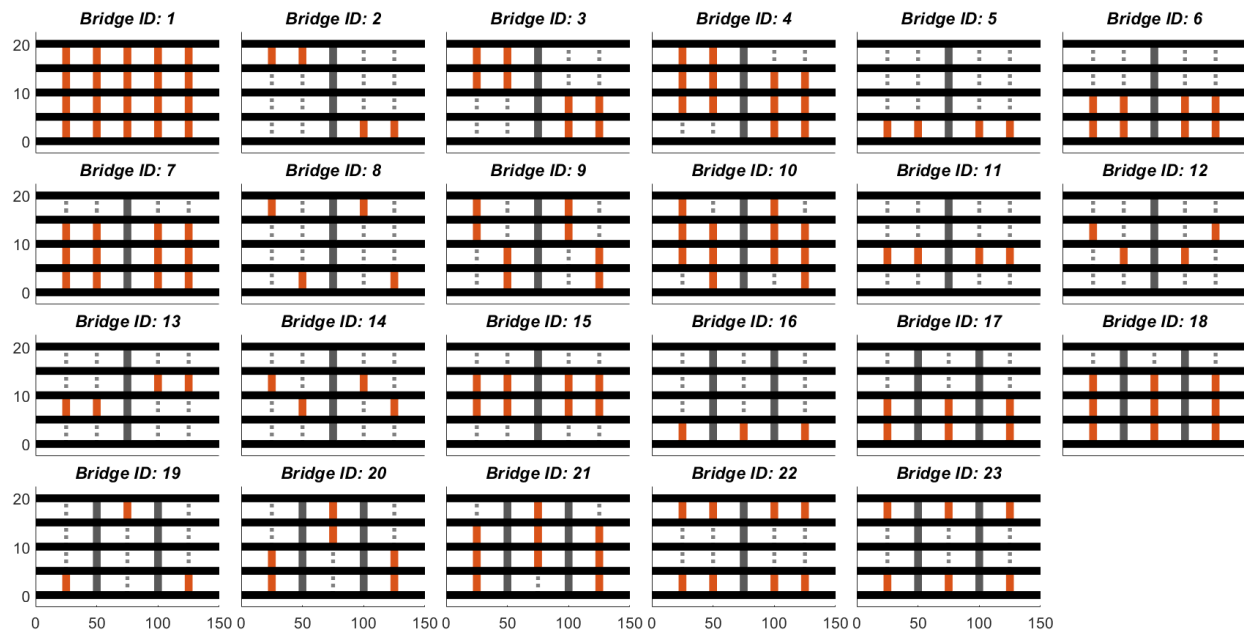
Girder Layouts Used in the Layout Effect Parametric Study
